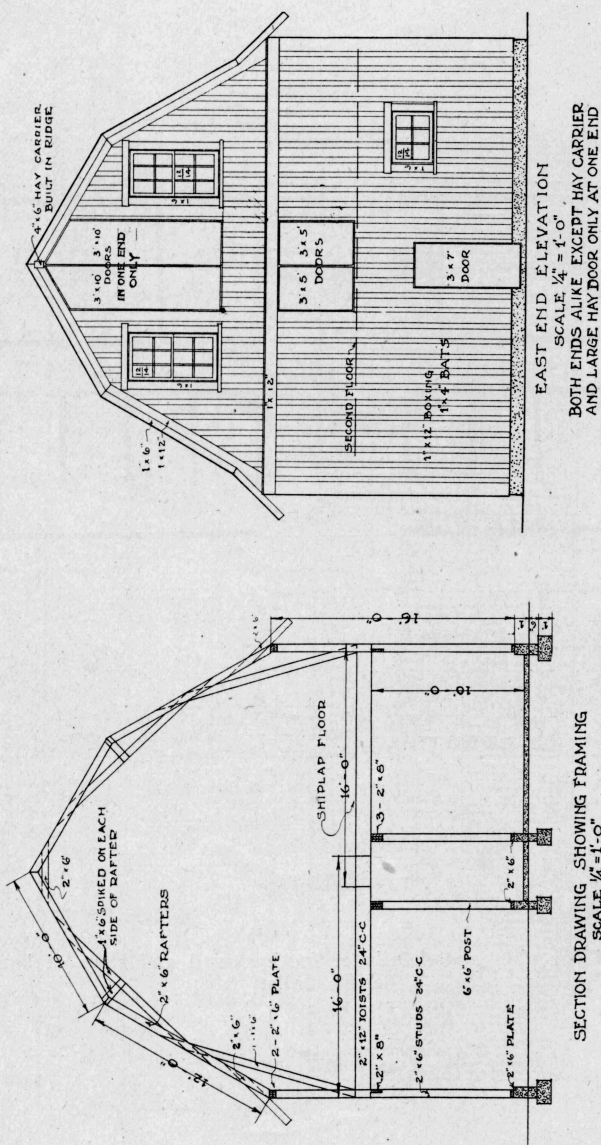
Framing detail and east end elevation of barn with eight stalls.
